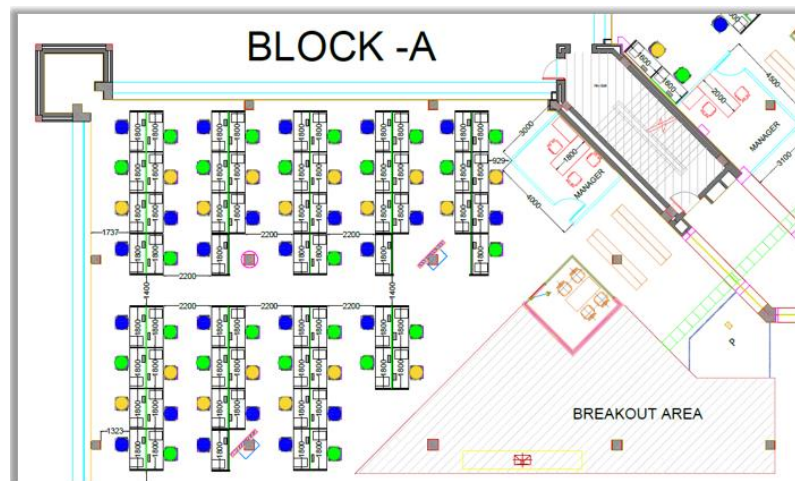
Location of Breakout Area and Workstations (Source: Design layout of BMF)
